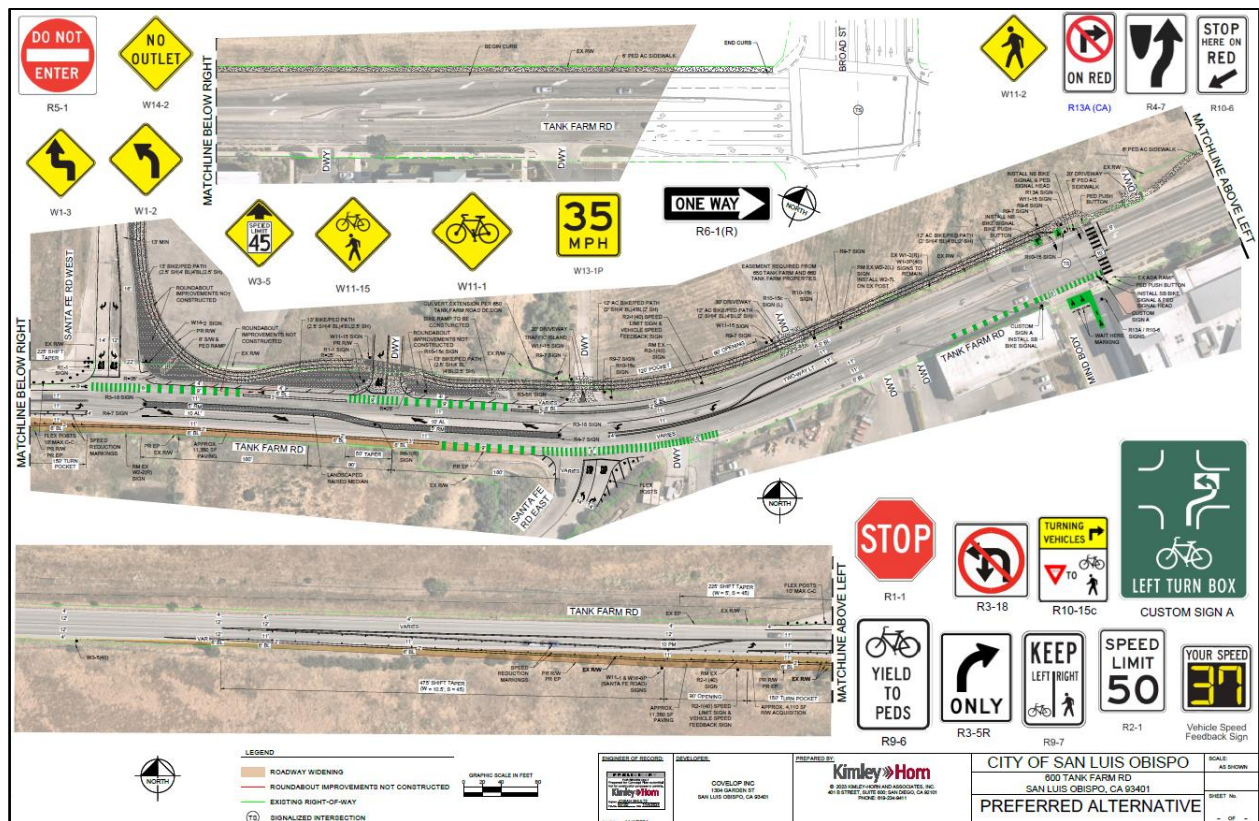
Proposed Interim Transportation Improvements Design Concept: Tank Farm Road
